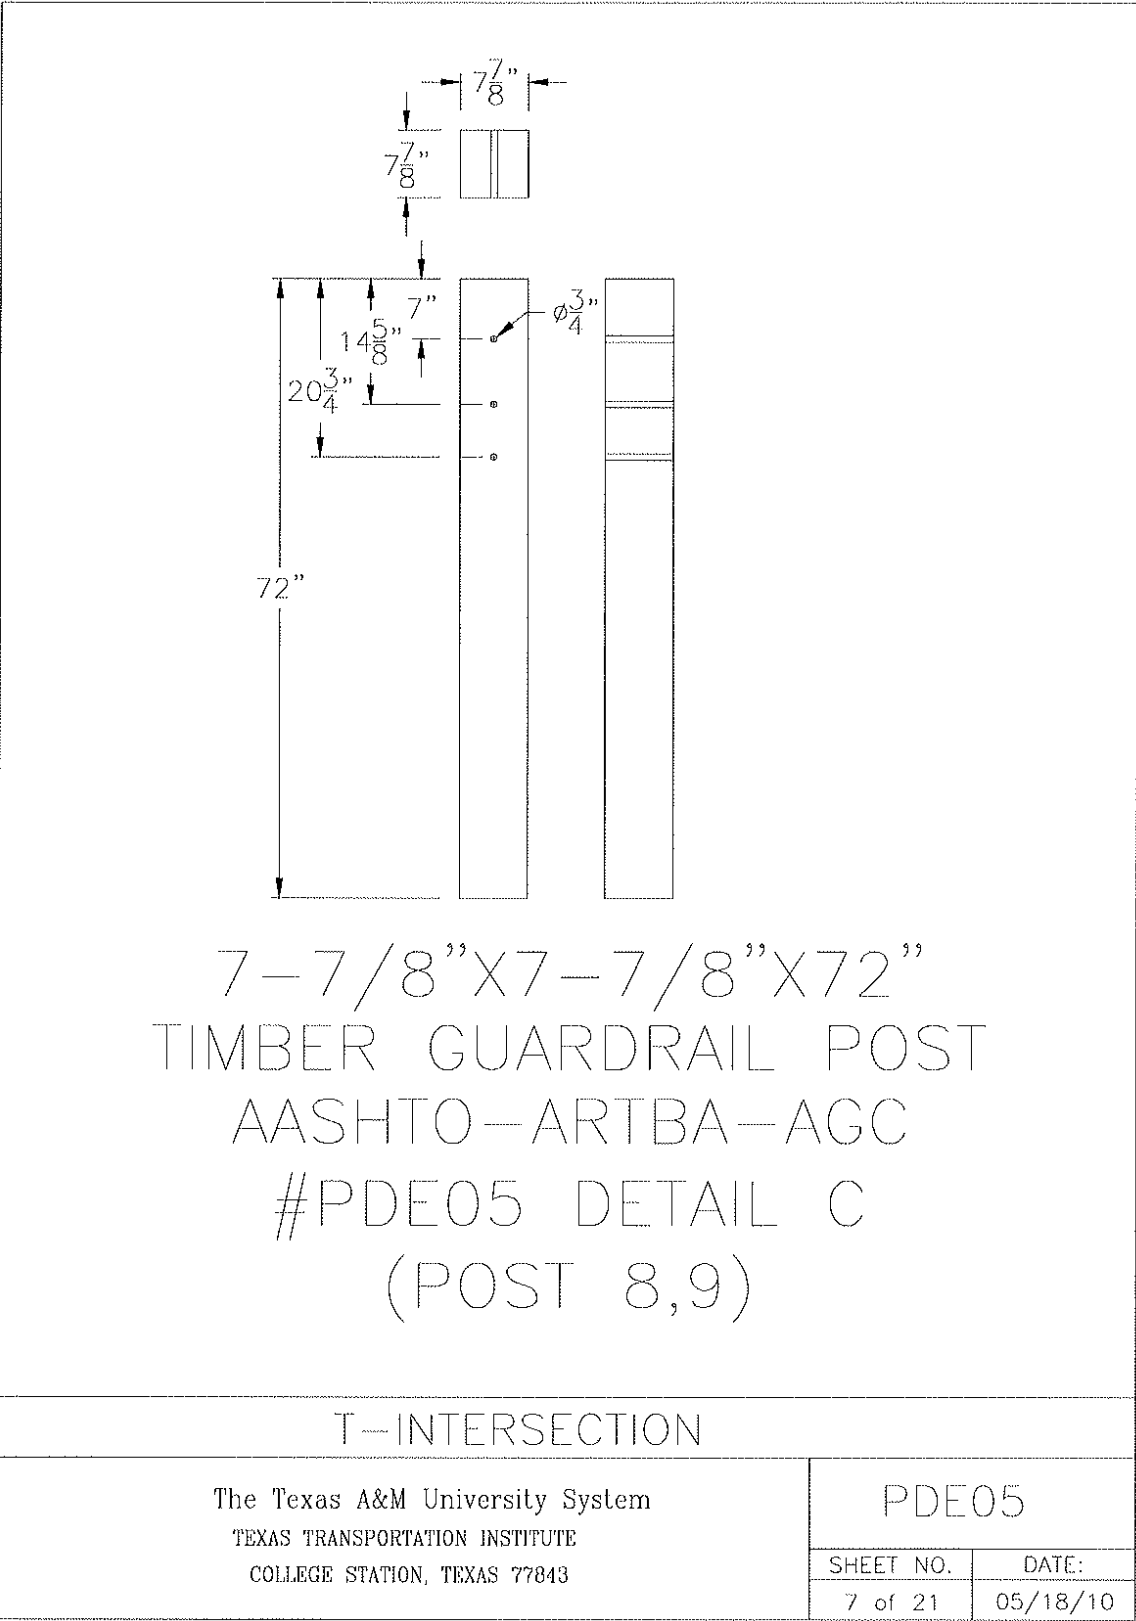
Transition Timber Post Details, Post Nos. 8 and 9 [27]
